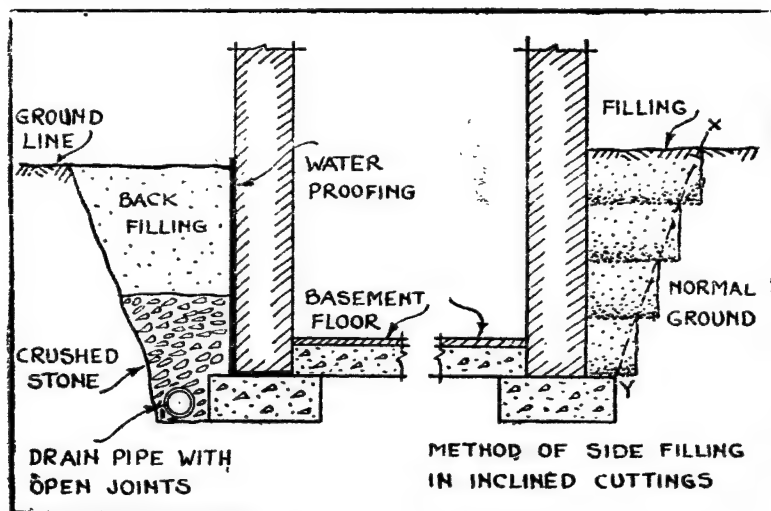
Drainage of foundation. Fig. 7. Soil filling in inclined cutting.
